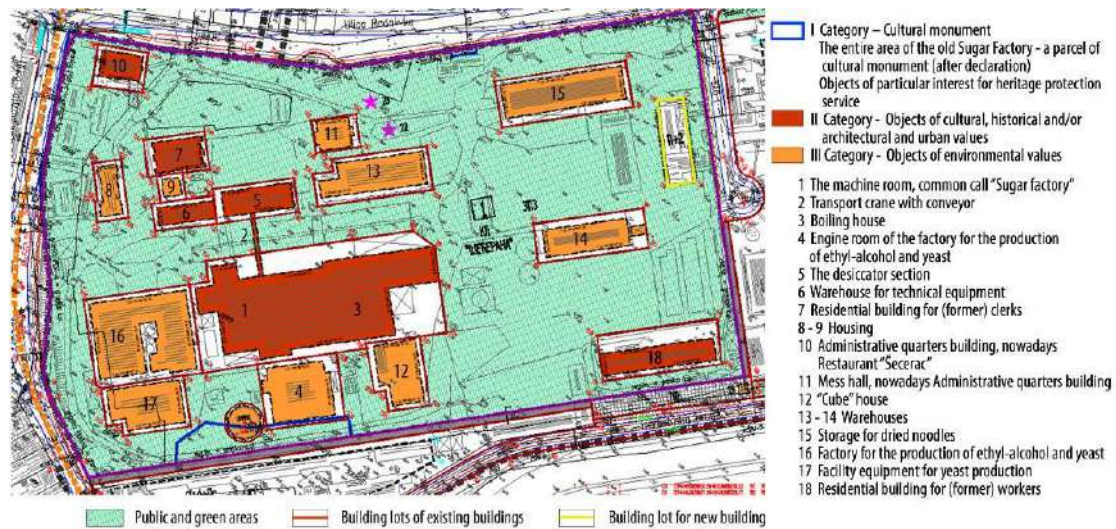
Sugar factory – Purpose plan area (DRP no. 98/16)
